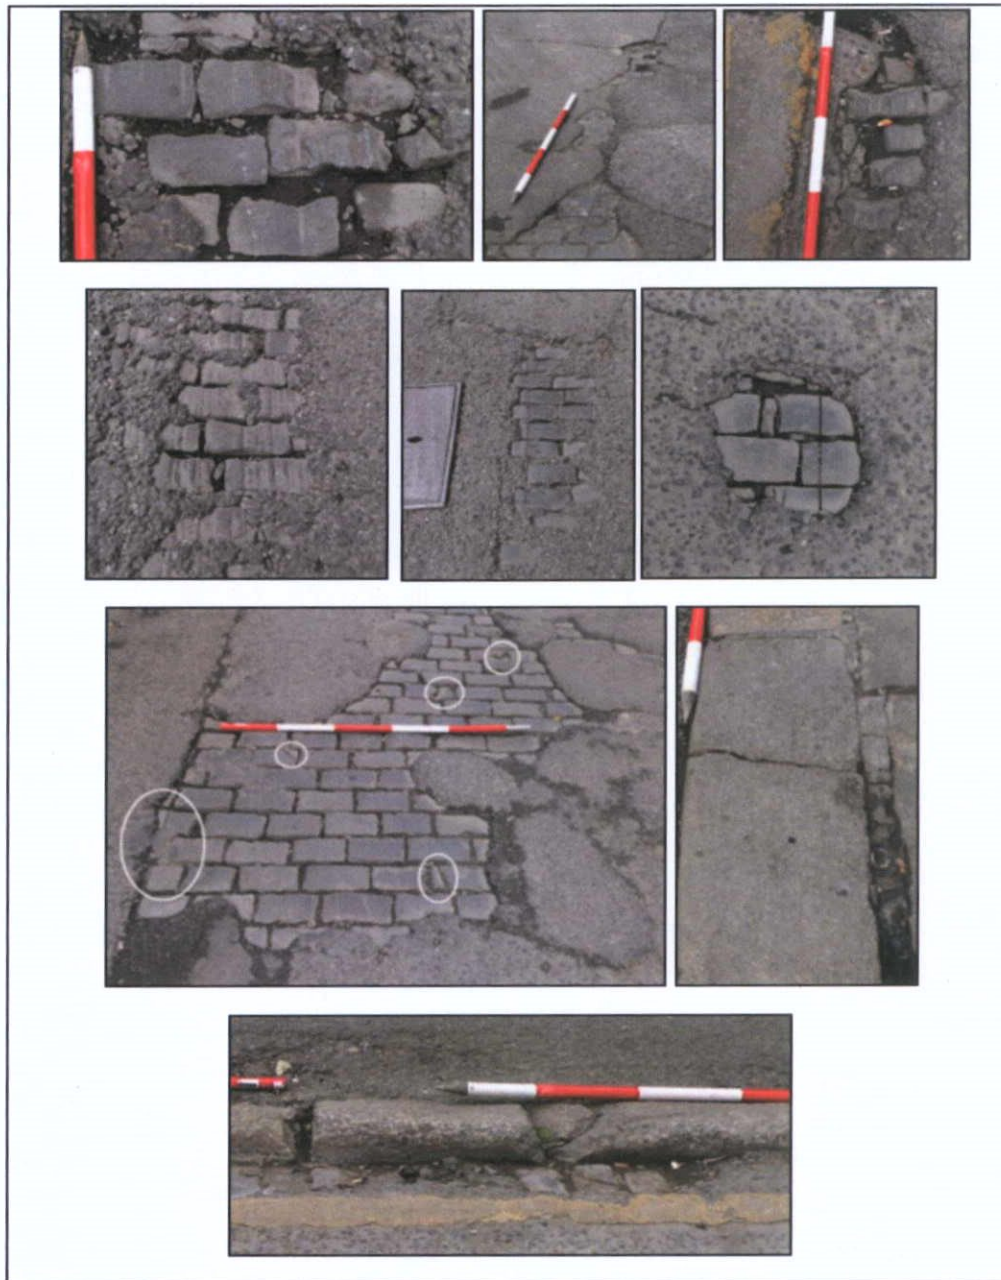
O'Rahilly Parade stone sett pavements beneath the tarmac surface
